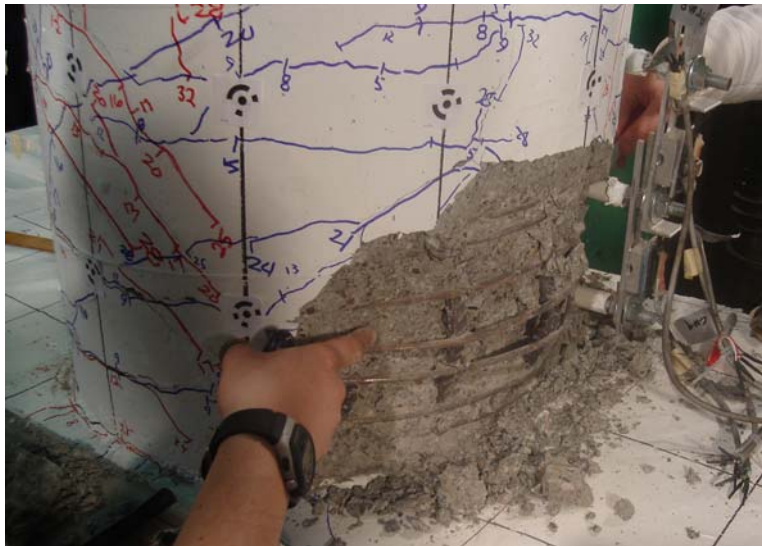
Cracking and damage in Specimen DB5-RE at Cycle 32 (5.60%/-5.52%)
